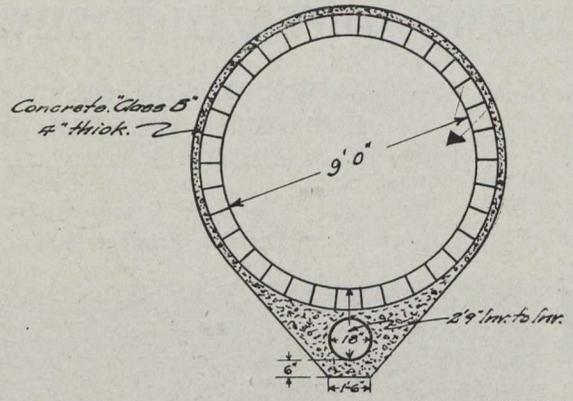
Alternative Section, Using Vitrified Segment Sewer Blocks.
